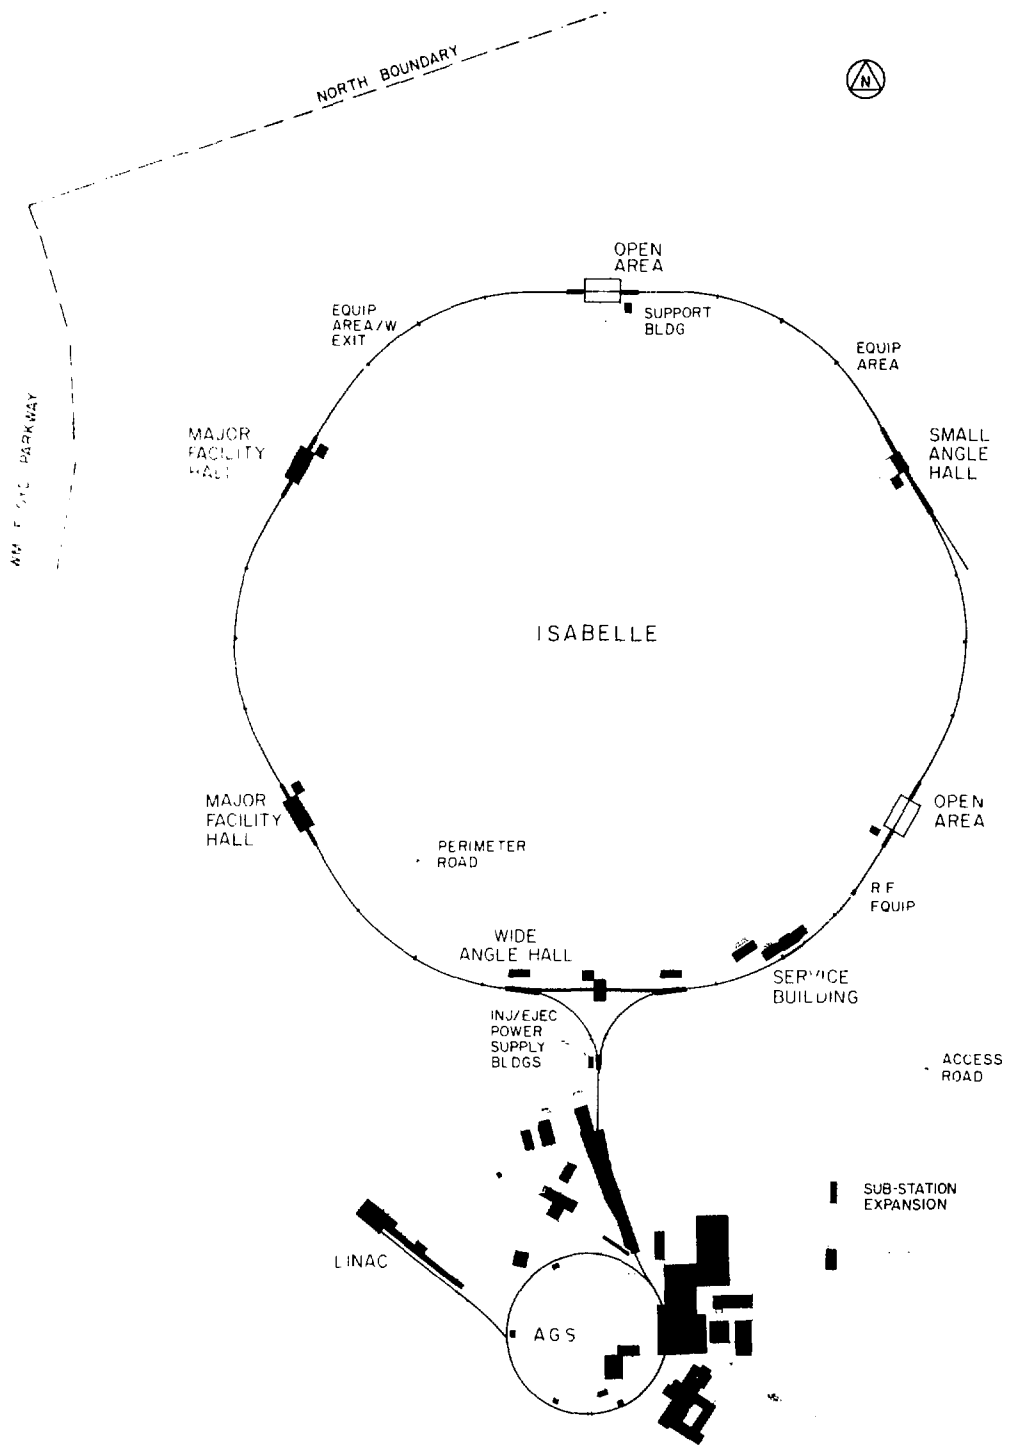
Layout of ISABELLE facility in the northwest corner of the Brookhaven site, showing its relation to the existing AGS.
